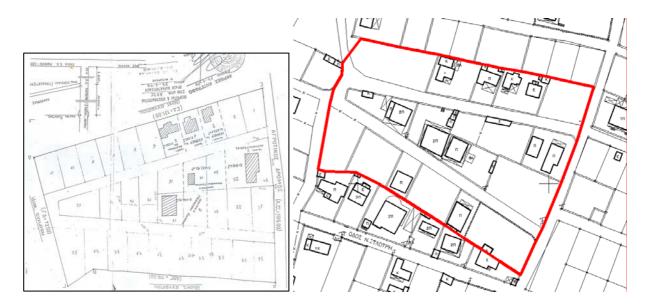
Plan submitted for the building permit (left); the created situation on the ground - the outline of the original land parcel, in red, does not exit (right)
